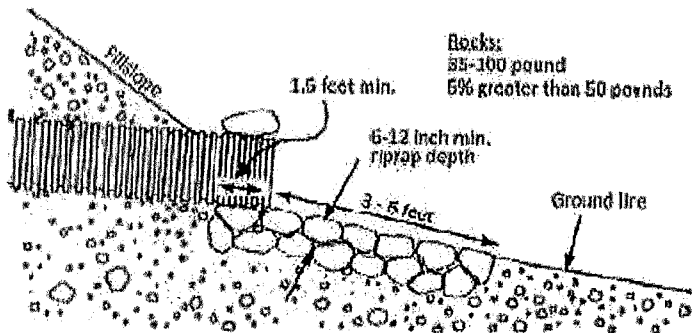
A. Riprap armor at culvert outlet (Modified from: Keller et al., 2011).
